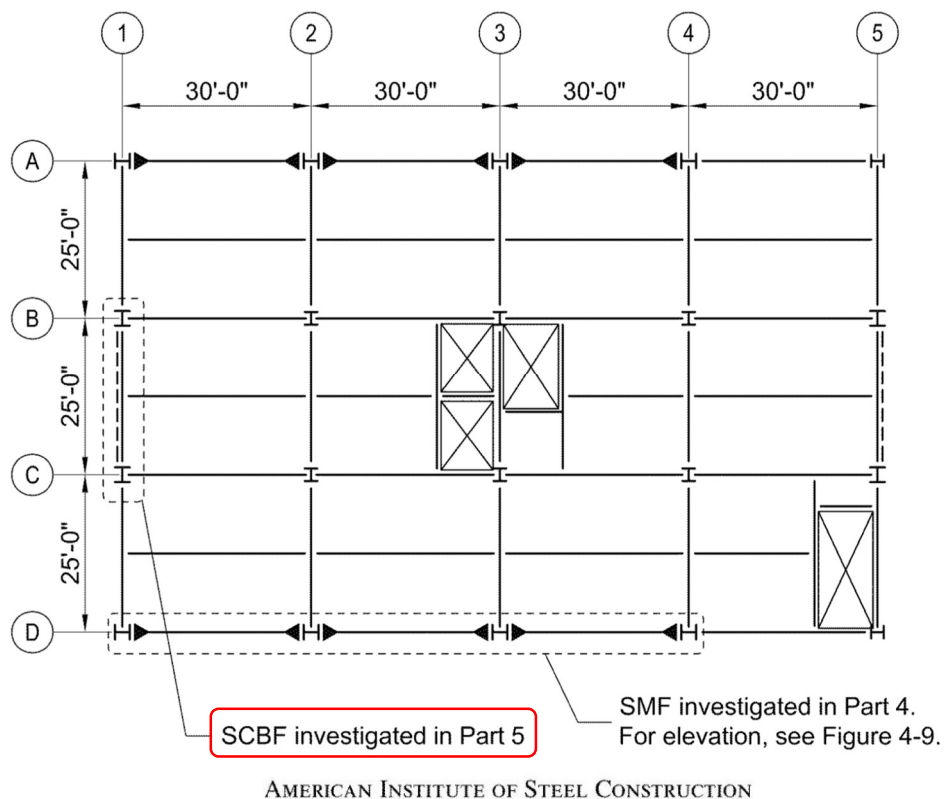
Floor plan of steel building highlighting the investigated SCBF (AISC 341, 2016)
